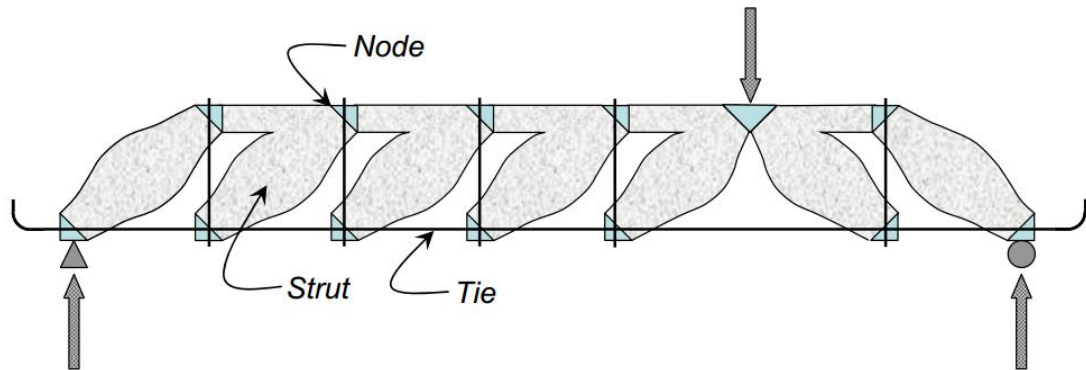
RC beam approximated as a truss by STM (Birrcher et al., 2009)
